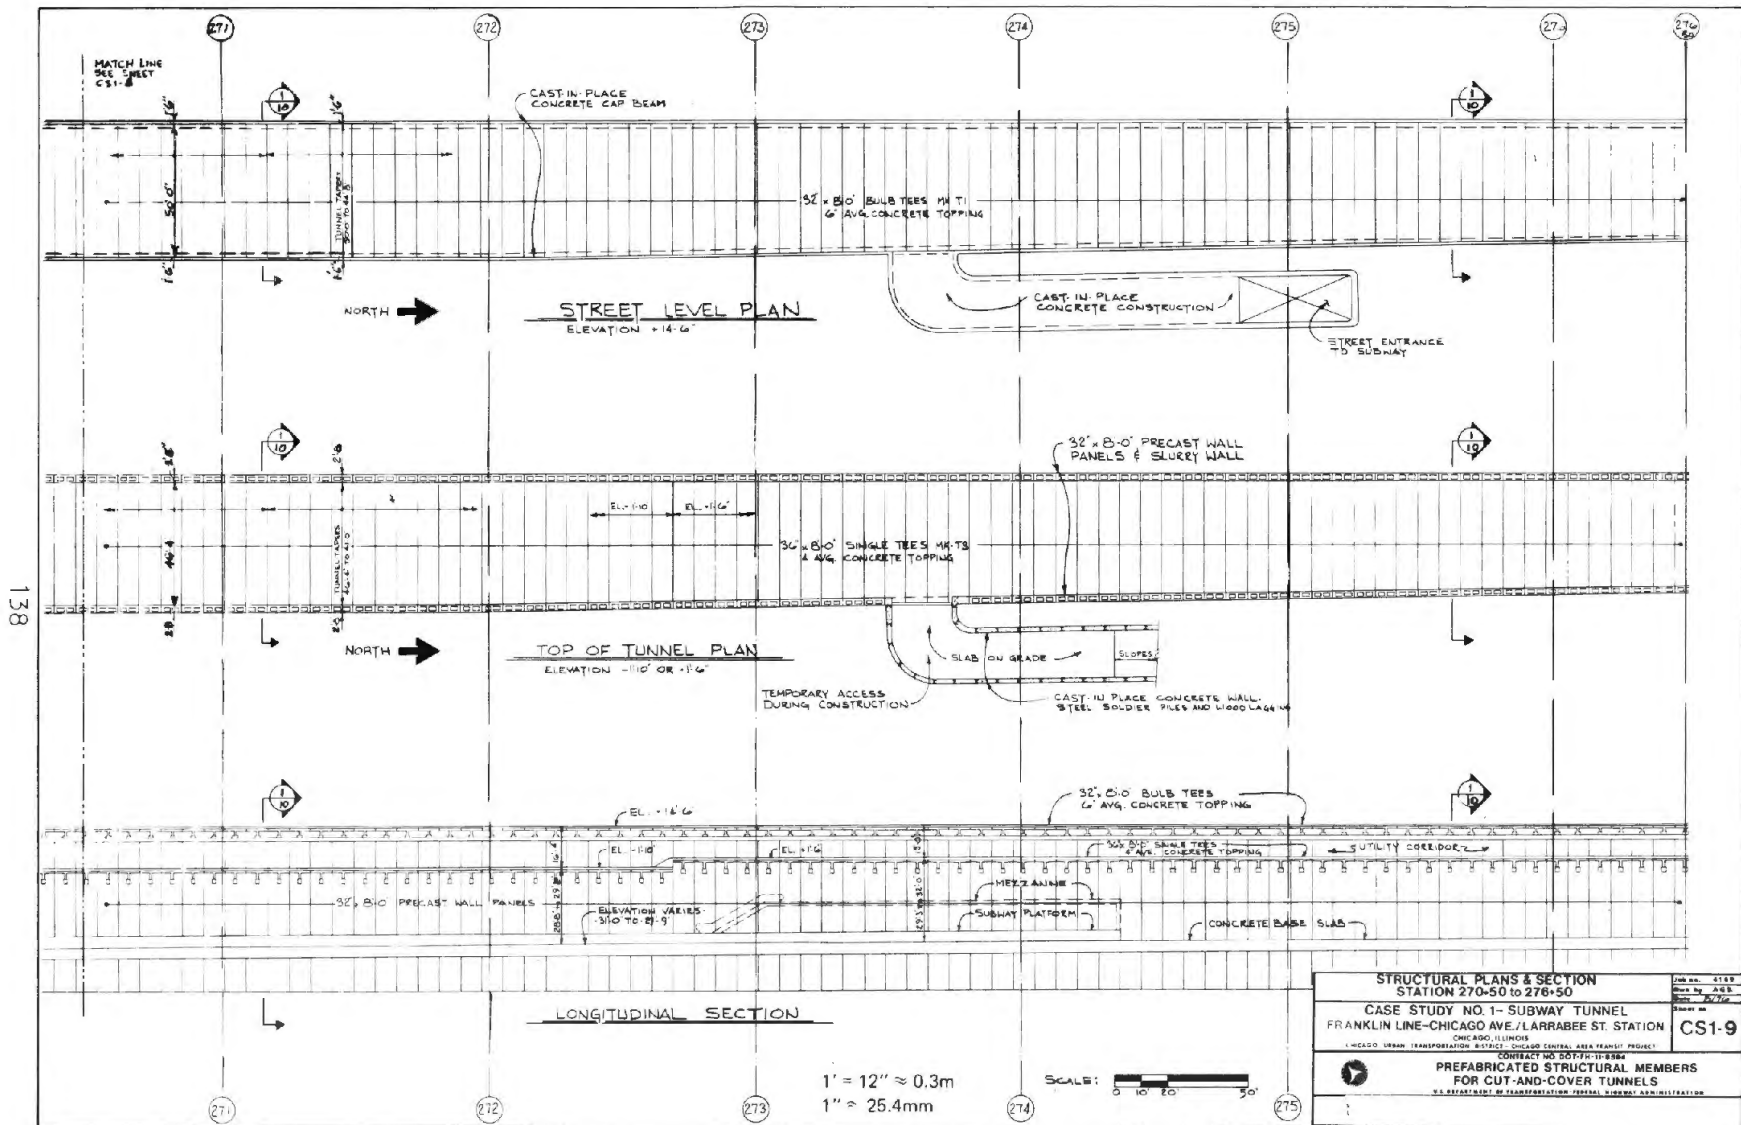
Case Study 1: Structural plans & section - Station 270 + 50 to 276 + 50
